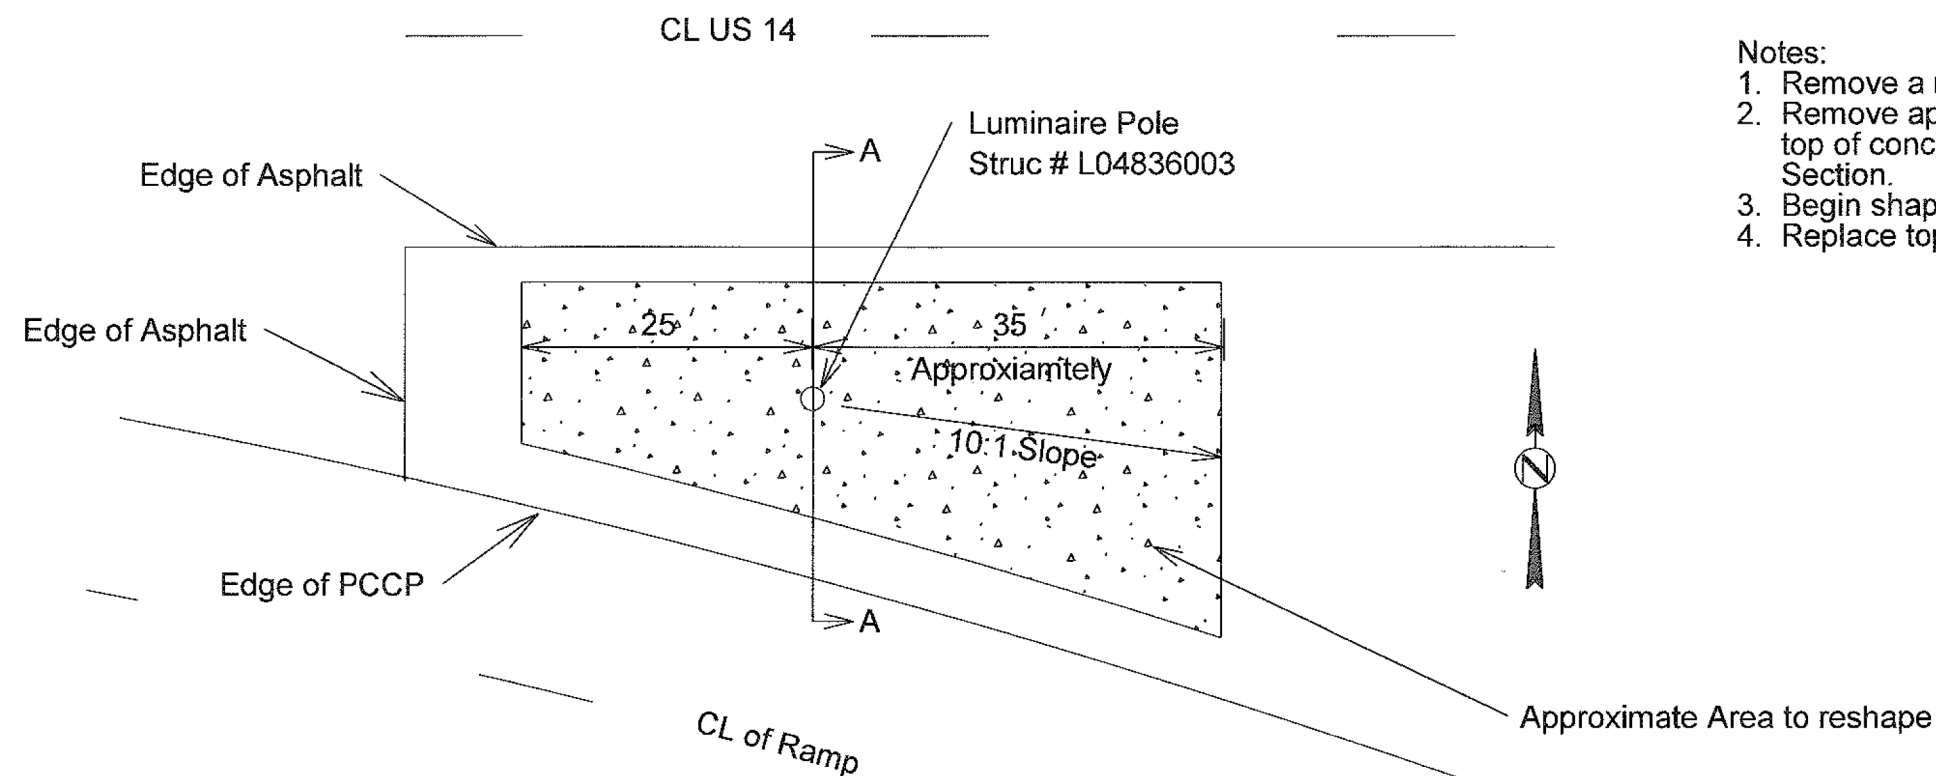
DETAILS FOR SHAPING AROUND LUMINAIRE POLE IN A CURB & GUTTER SECTION
